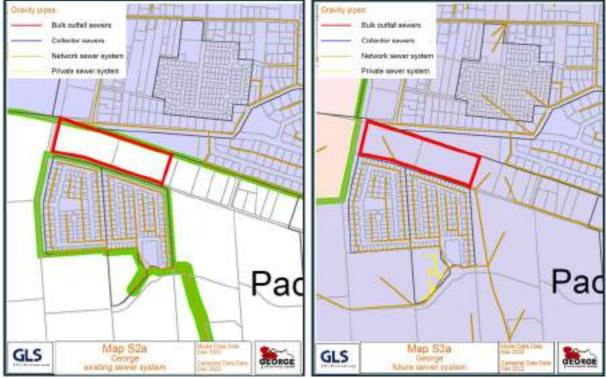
GLS Consulting Existing and Proposed Future Sewer system
